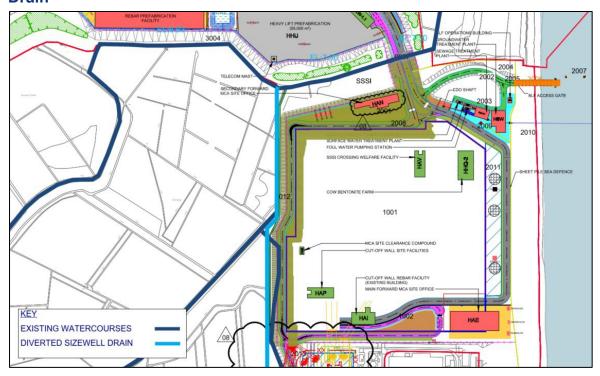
Existing Leiston and Sizewell Drains – Extract from SZC Water
